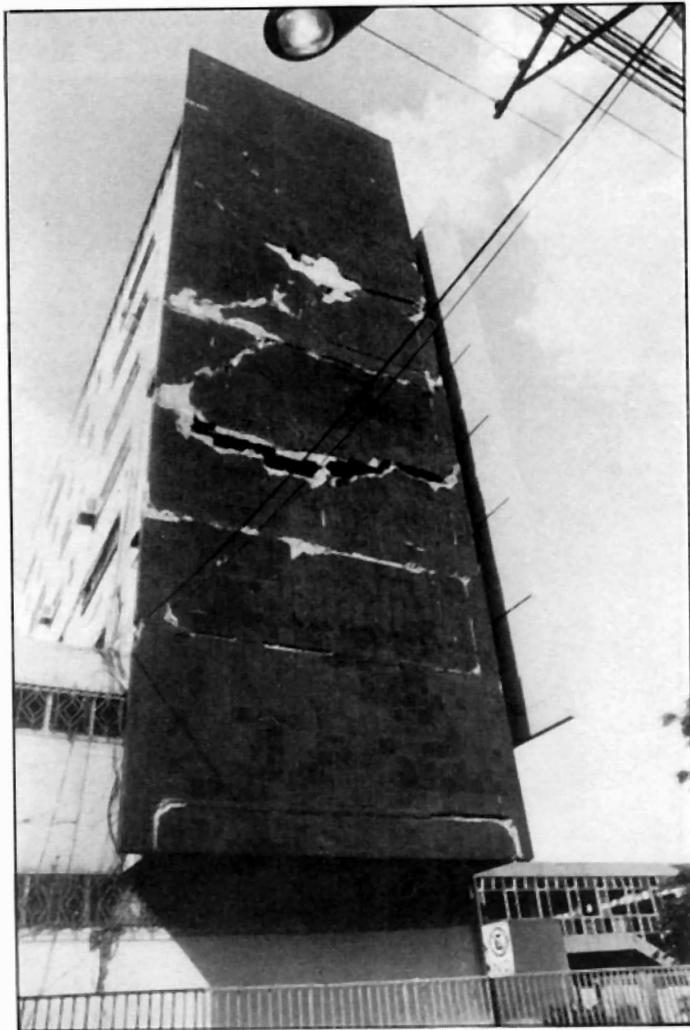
FAILURE OF MASONRY PANELS
